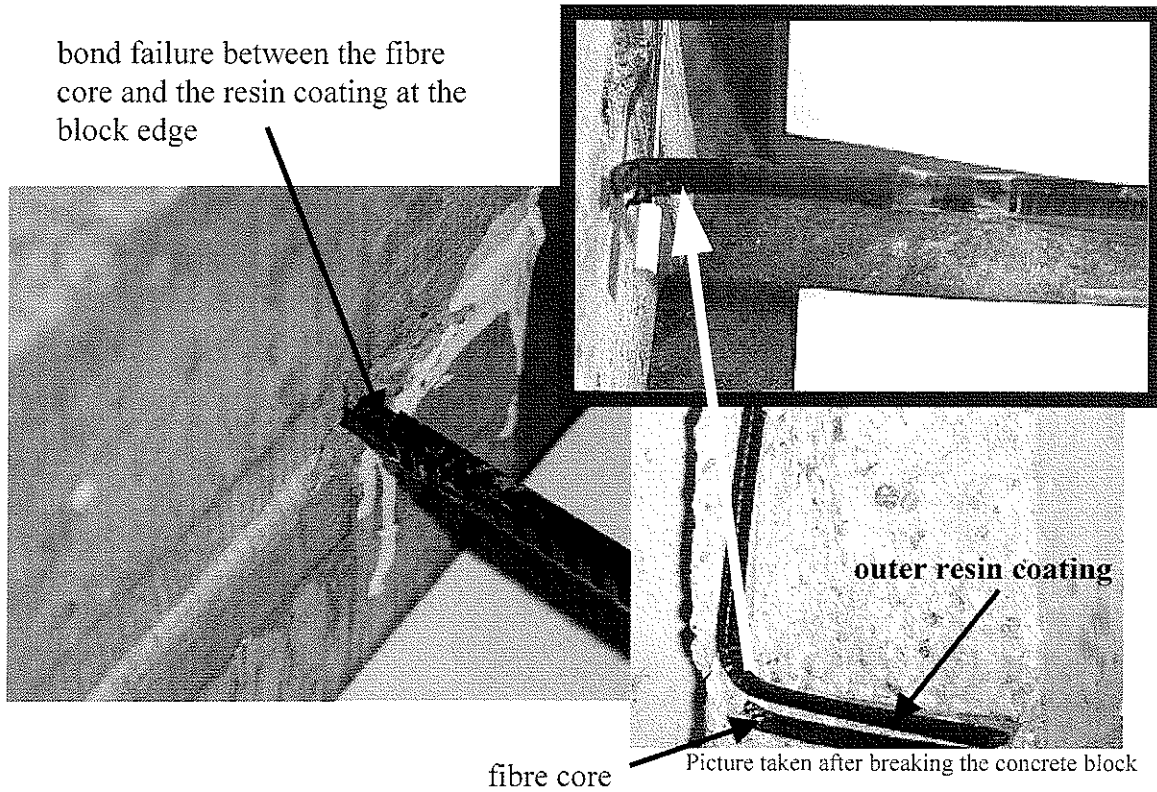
Failure at the bend - CFRP Leadline stirrups
